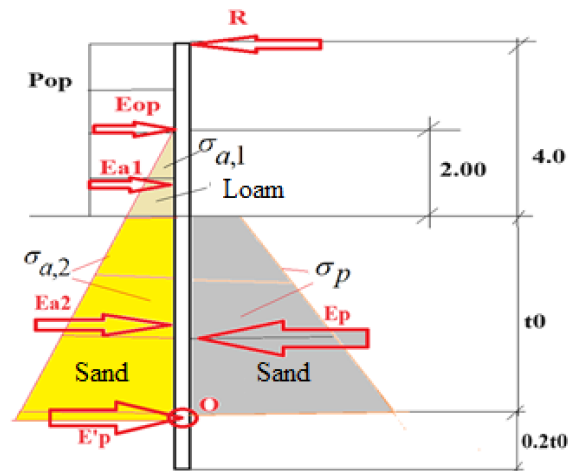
Scheme of application of shear and resisting forces to the retaining wall
